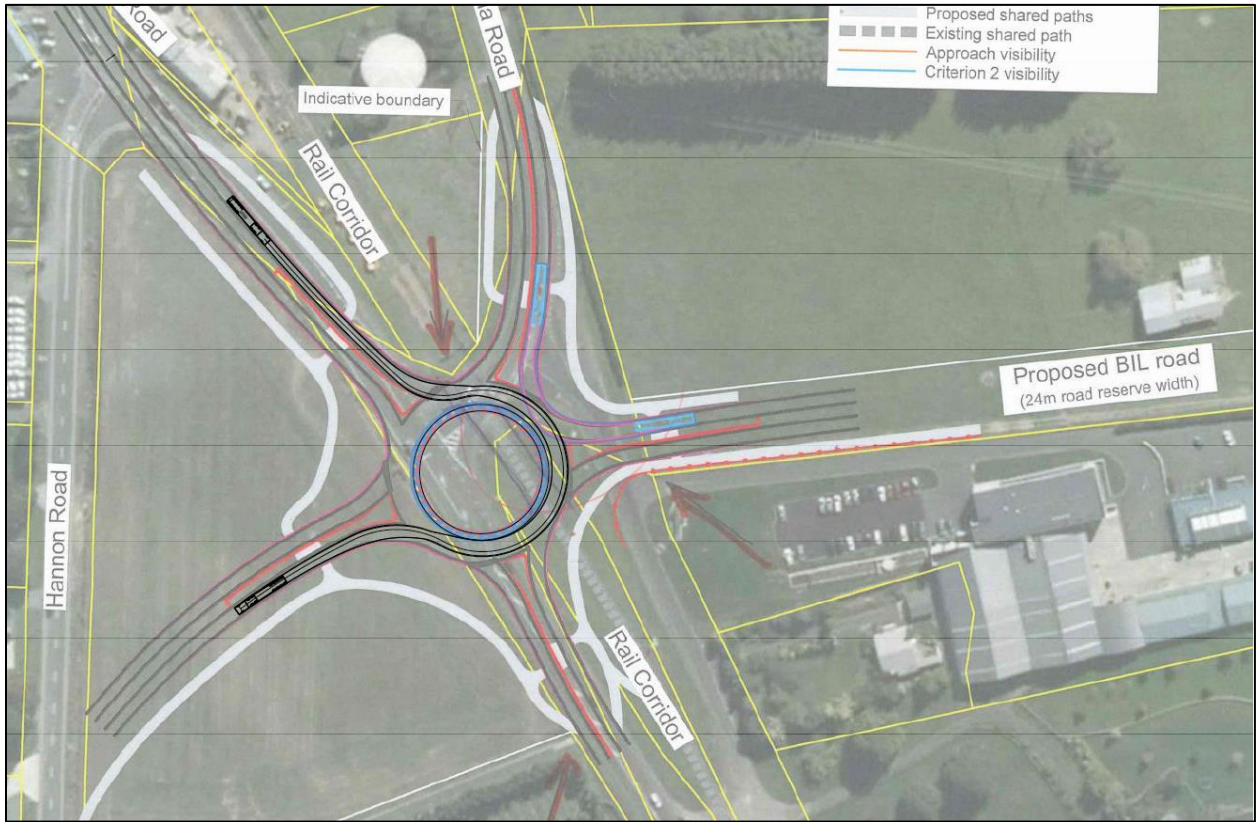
Single Roundabout - Hautapu Road to Hannon Road
